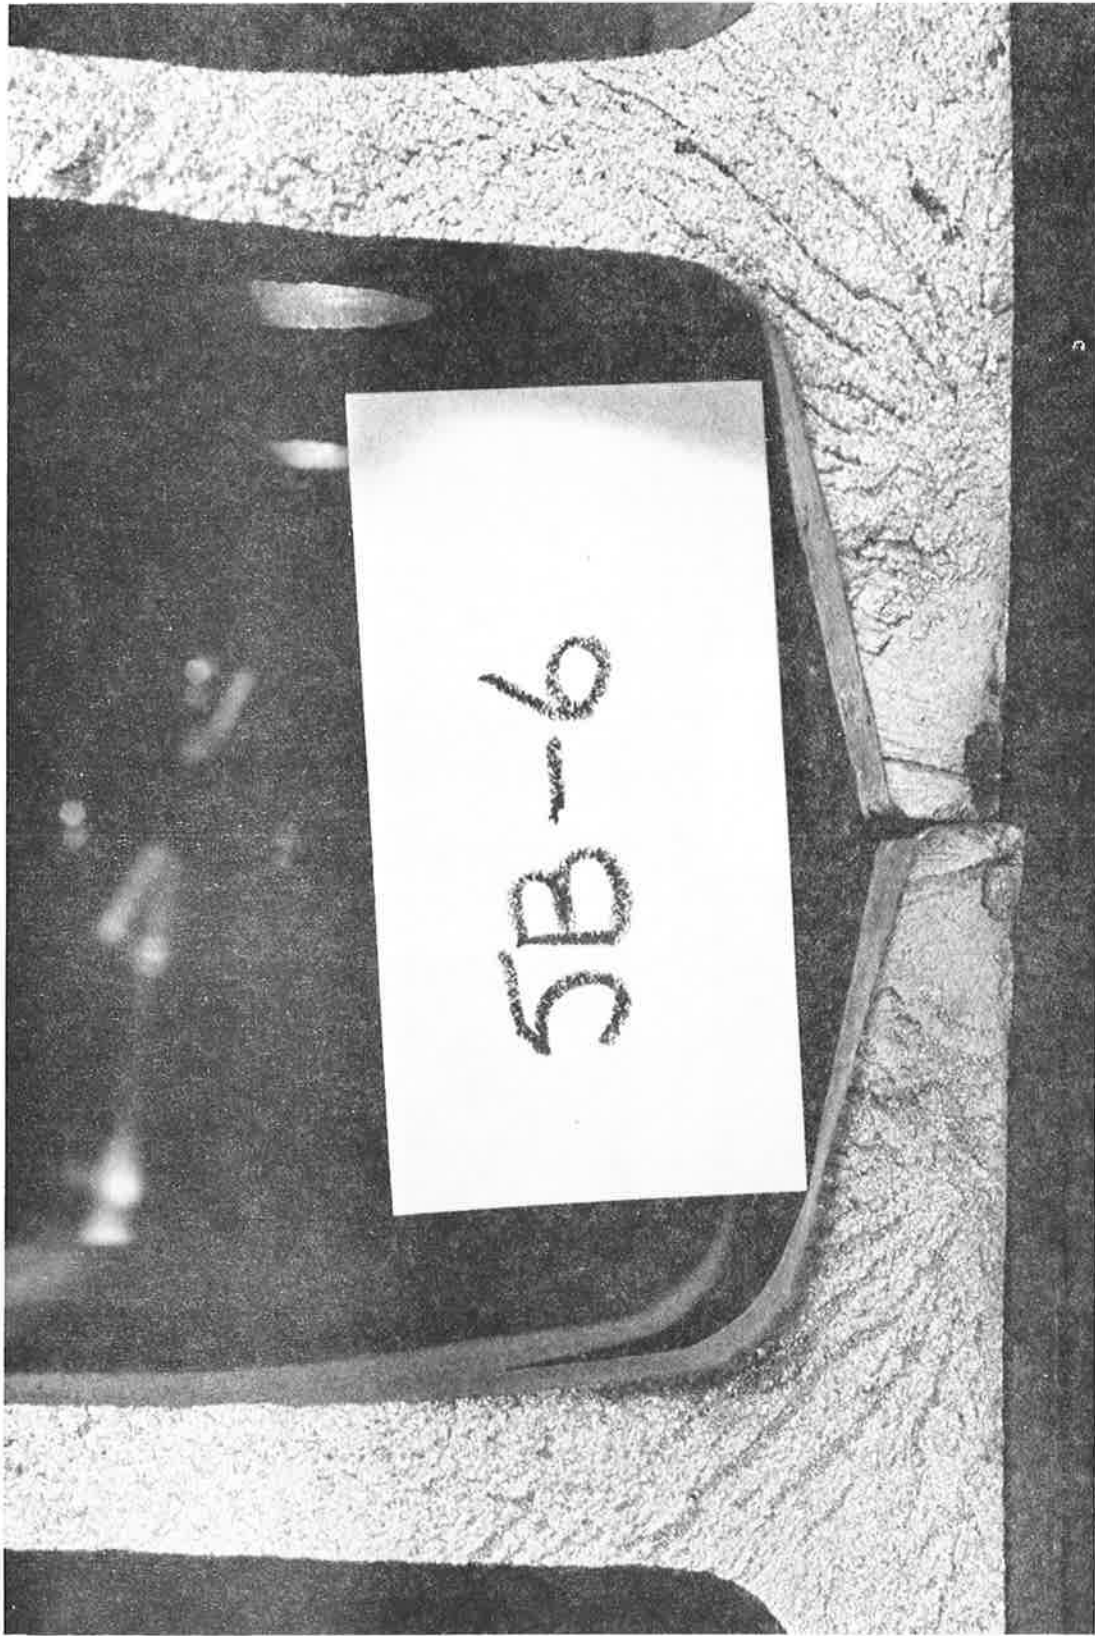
Specimen 5B-6: View of Fracture Surface
